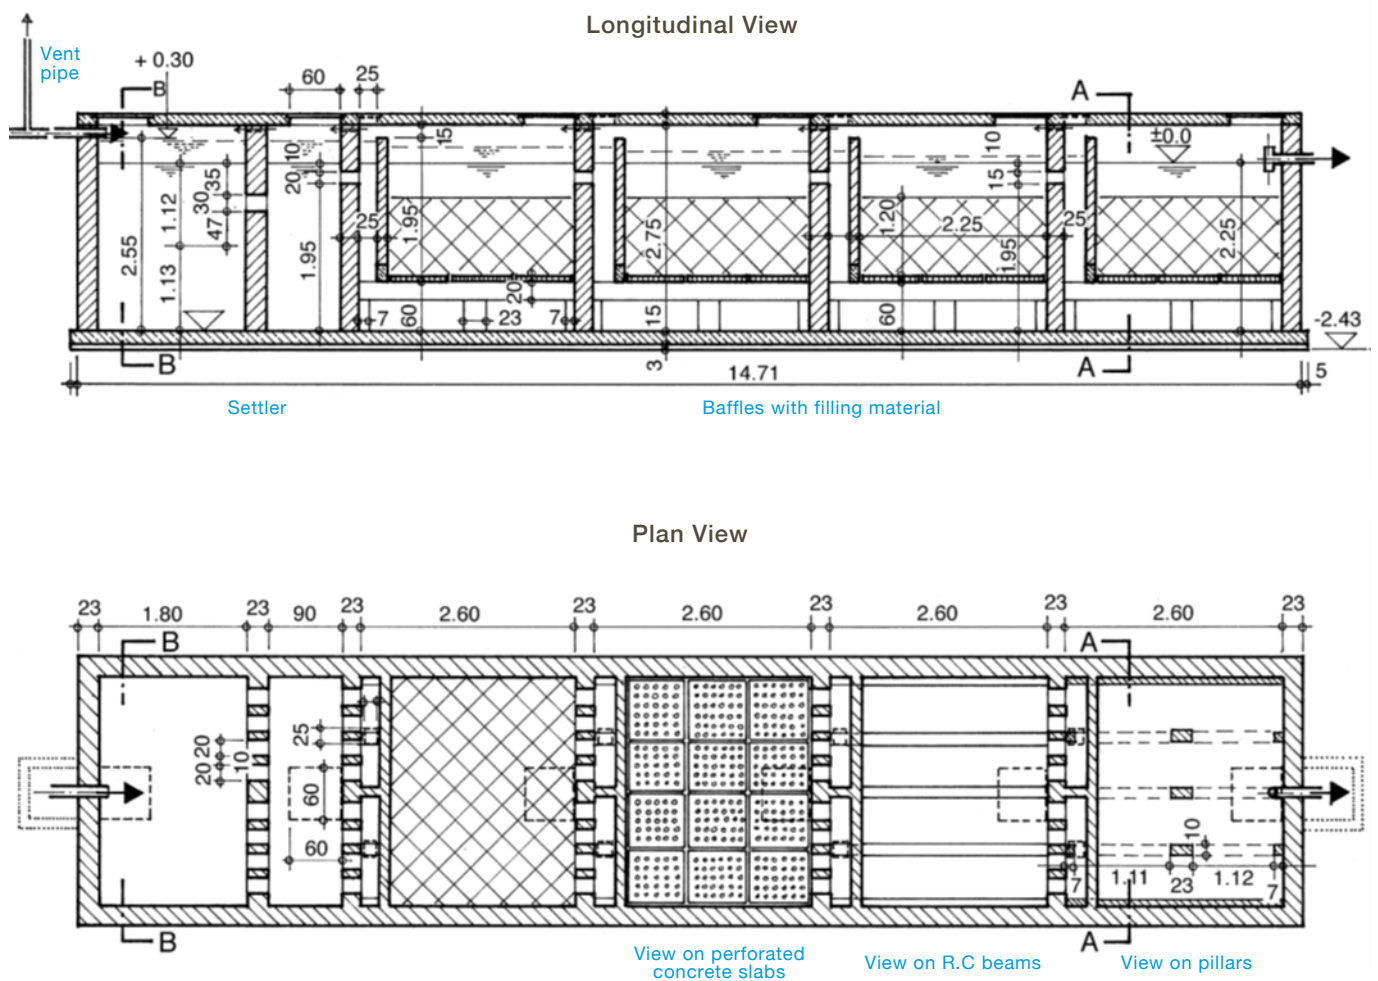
Longitudinal section and plan view of an AF.^[5]
